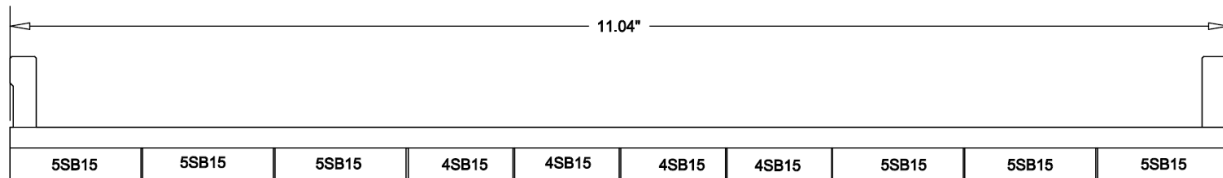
Bridge Model 3: 46’ wide deck with six 5SB-15 and four 4SB-15 slab beams
